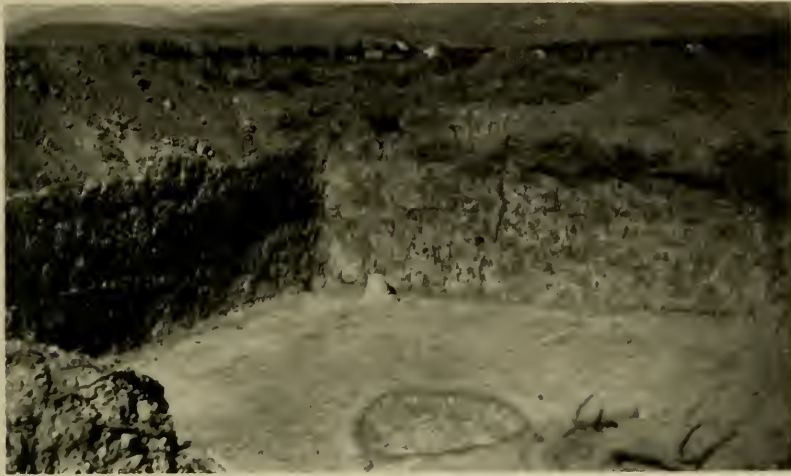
Walls and fireplace of a large adobe structure at Beaver City, Utah.
